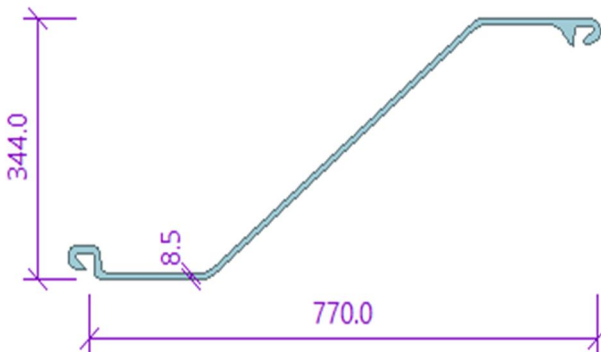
Z-section (AZ12-700) sheet pile wall
